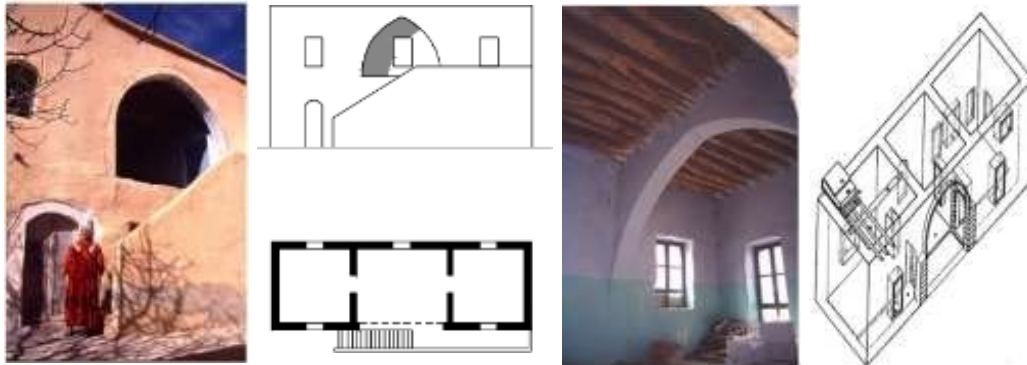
Rural house with Iwan: exterior view (left), plan, elevation and 3D section (center), and interior (right).
